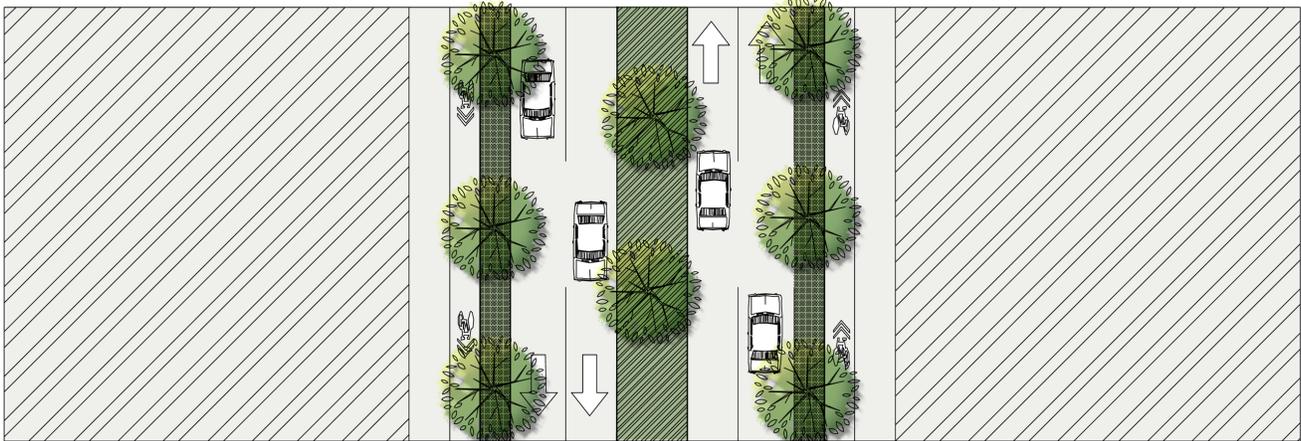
Section, Frontage Road (Woods Mill Road): Woods Mill Road represents a frontage road along the west side of Route 141 in Manchester. The section below outlines the recommended setbacks from Route 141 and the setbacks from buildings to Woods Mill Road.
